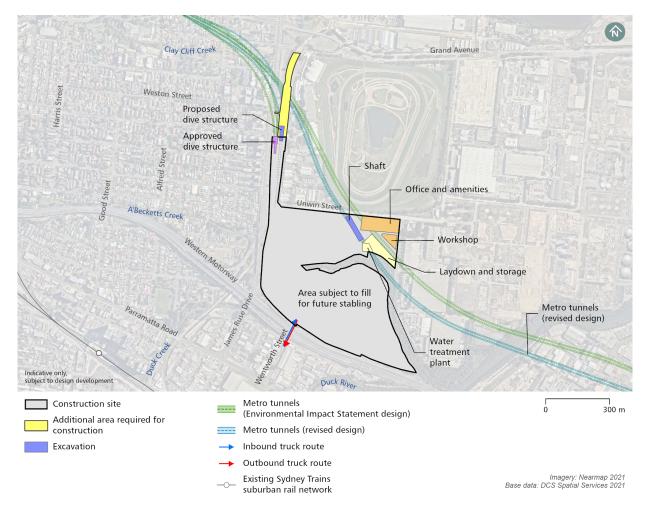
Clyde stabling and maintenance facility indicative construction site layout – dive structure (approved project and proposed modification)
